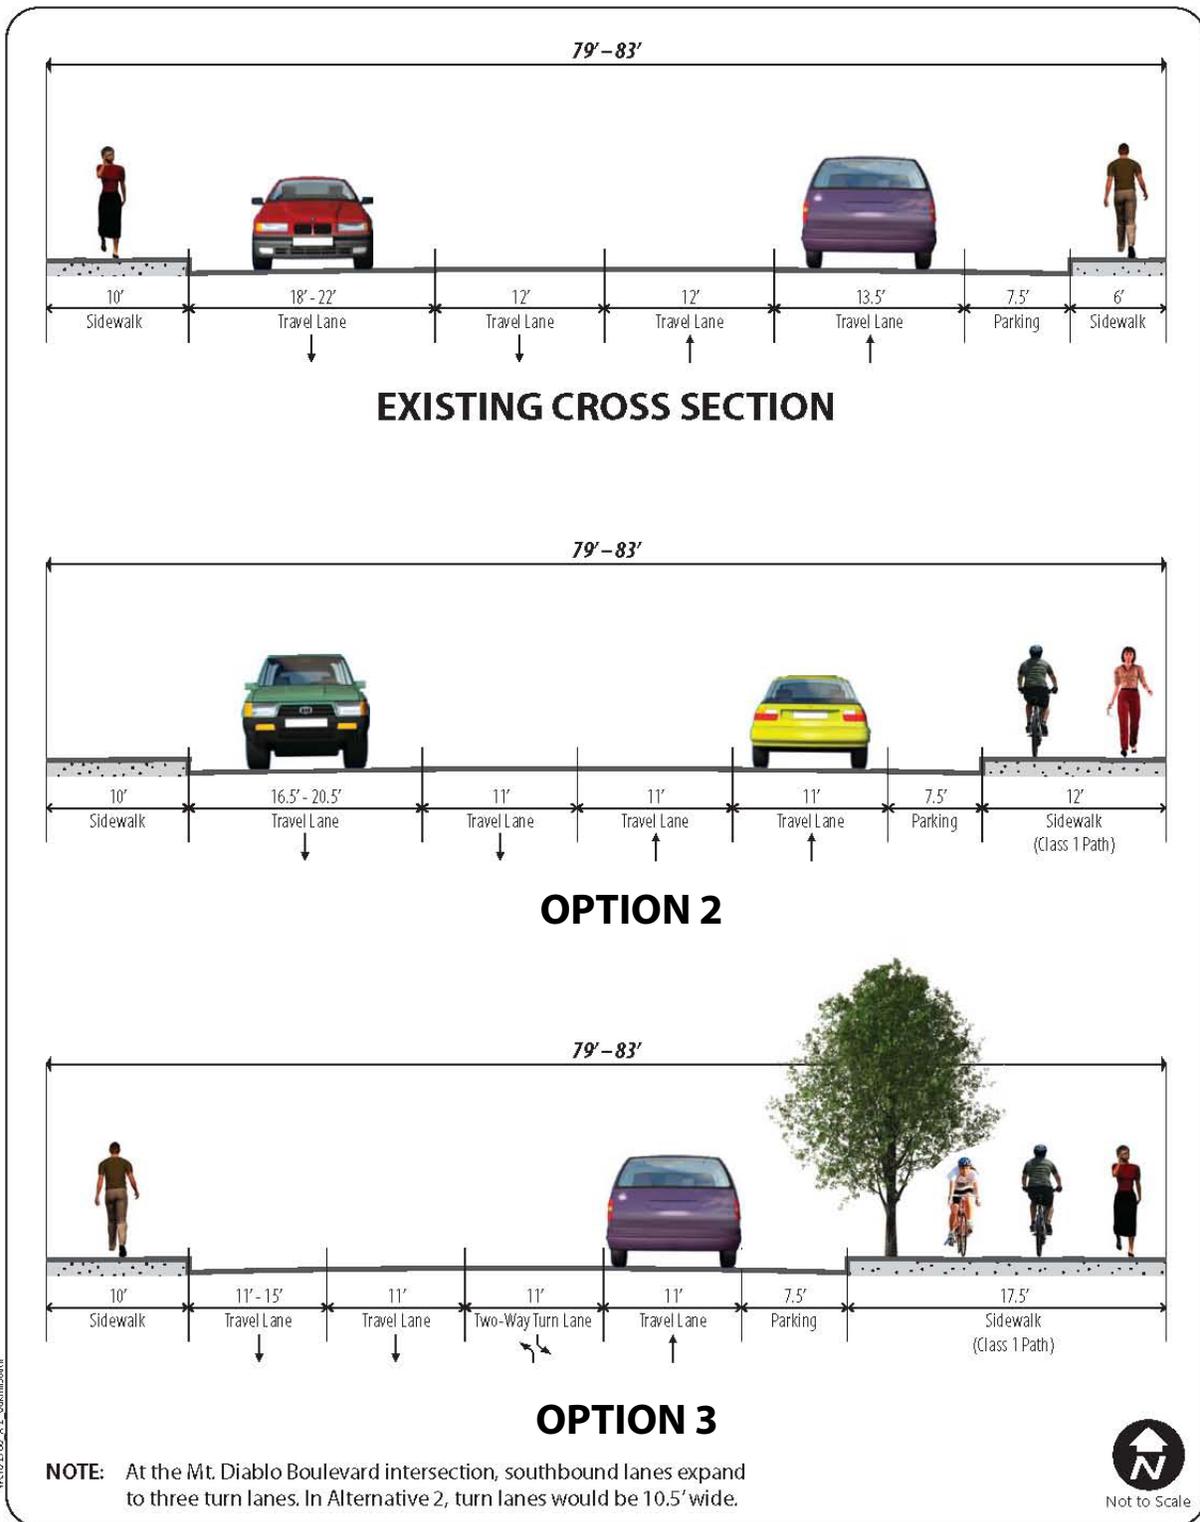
Oak Hill Road South of SR 24: Existing and Proposed Cross Sections
